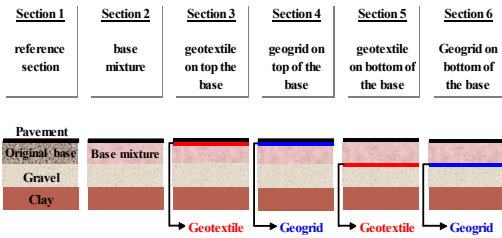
Pavement test sections (Gomes & Saraiva, 2010).
